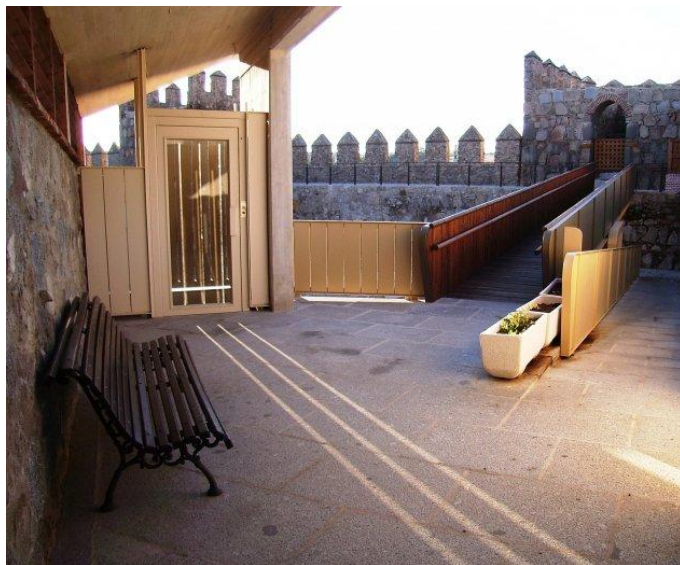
Installation of ramps and lifts making the walls of Ávila accessible (Muralla de Ávila, n.d.)
